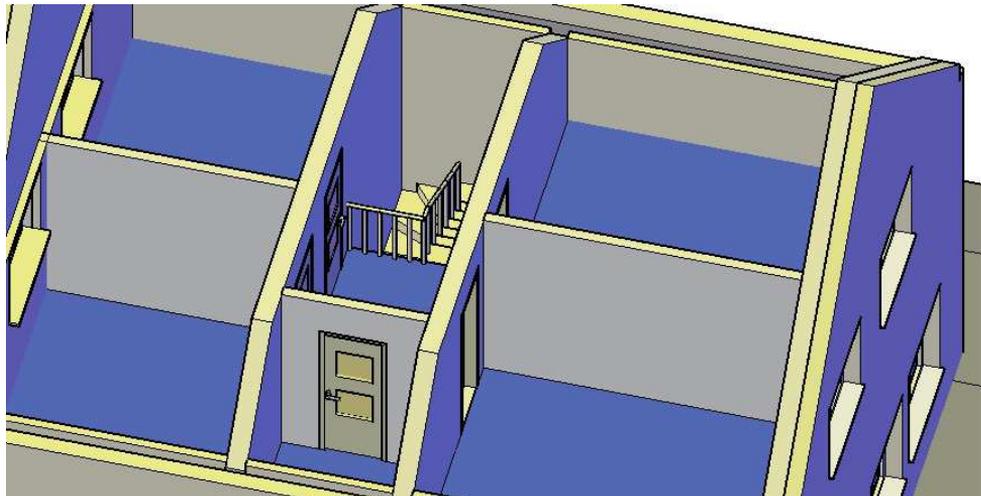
Attic of the modeled house with details like door, handles, banister, internal and external window sills
